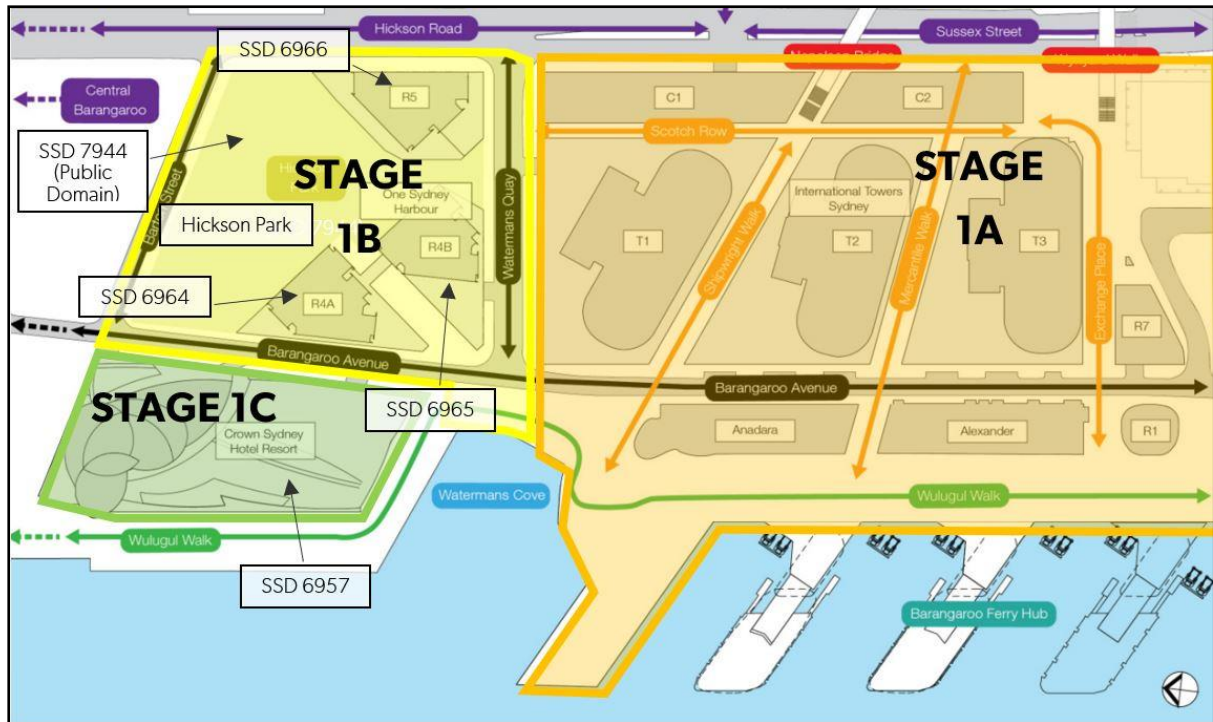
| Barangaroo South buildings and construction stages – CSHR part of Stage 1C (highlighted green) (Base source: Applicant's EIS)
